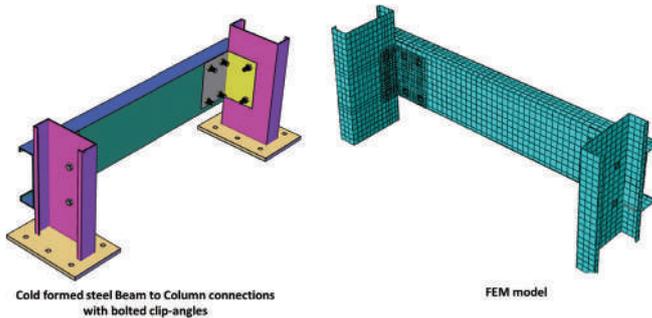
Cold formed steel connections between Beam- Beam & Beam-Column with clip angles under cyclic loading
